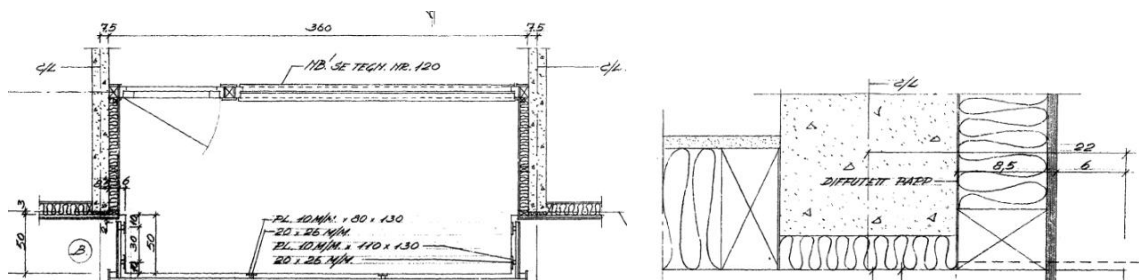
Myhrerenga: detail in the connection between the structural walls and the external walls
